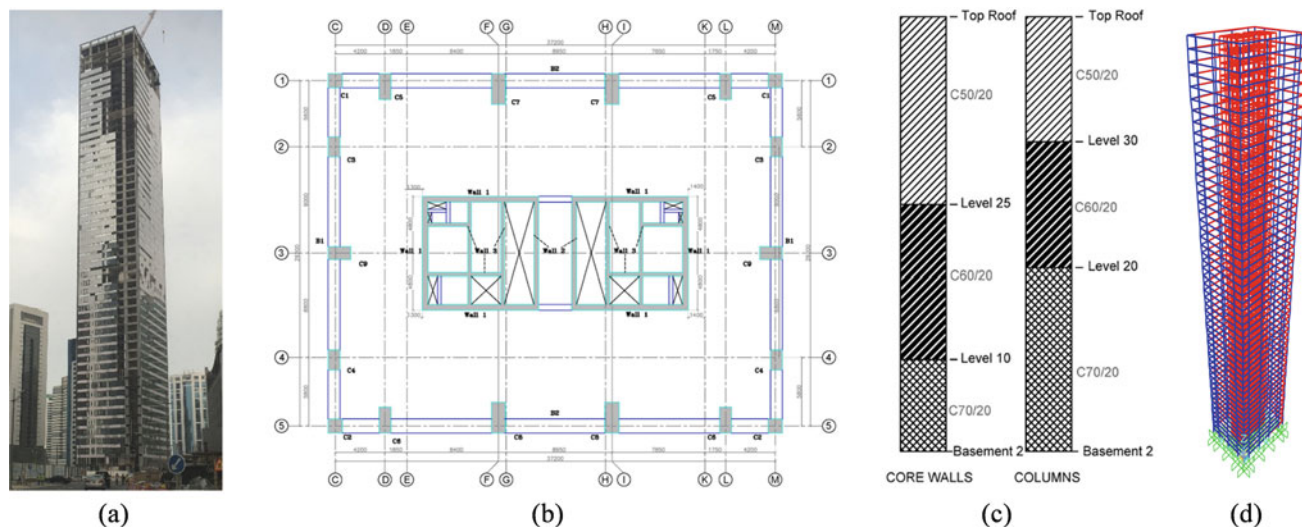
(a) Tower structure; (b) typical plan view; (c) variation of concrete strength along the height; (d) 3D FE model
